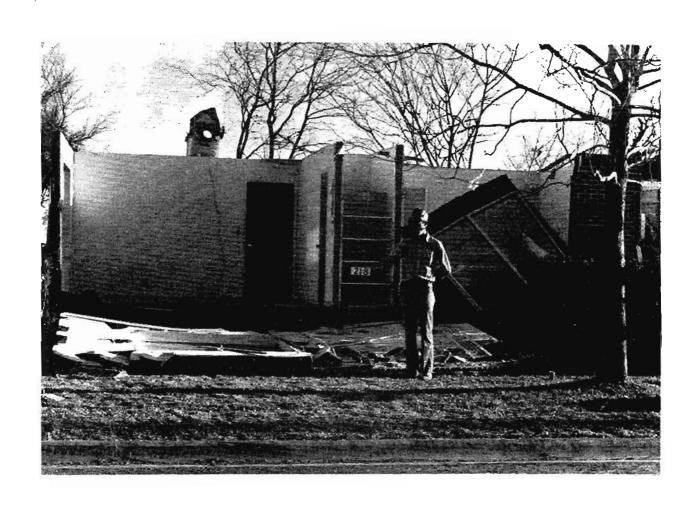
HOUSES ARE OFTEN DAMAGED THROUGH PROGRESSIVE FAILURES AFTER A WEAK COMPONENT IS REMOVED. The walls of this house fell outward after the roof was removed.
